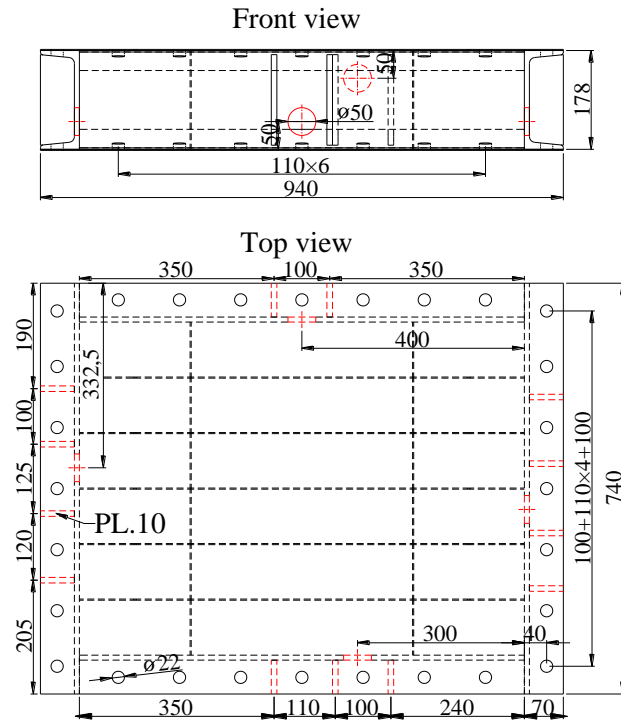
Dimensions of the specimen. Dimensions in mm.
